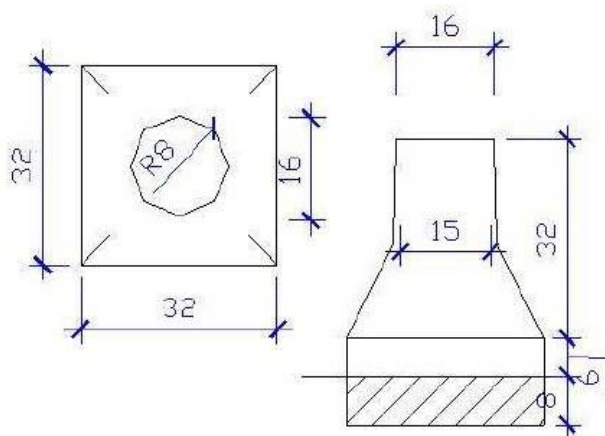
& 2.5.22 Plans for reconstruction of elements
